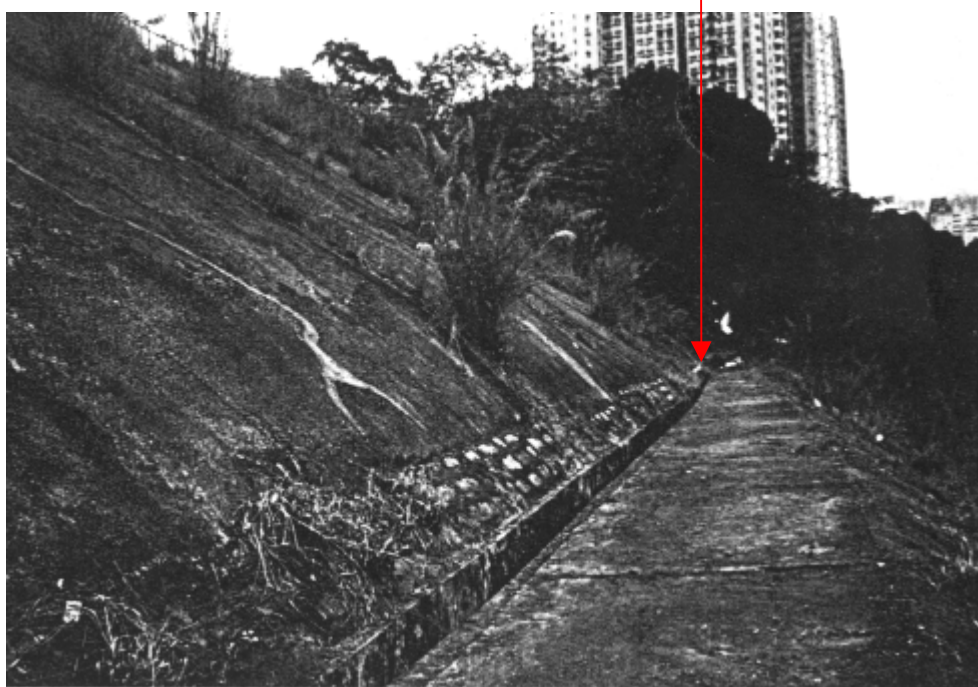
View South-east Along Upper Berm. Note Repaired Cracking, Stone Pitching Above Berm Channel and Convex Shape of Lower Portion of Slope. Note Also Apparent Distortion of Berm Channel (Photograph Taken on 20 March 1995)
